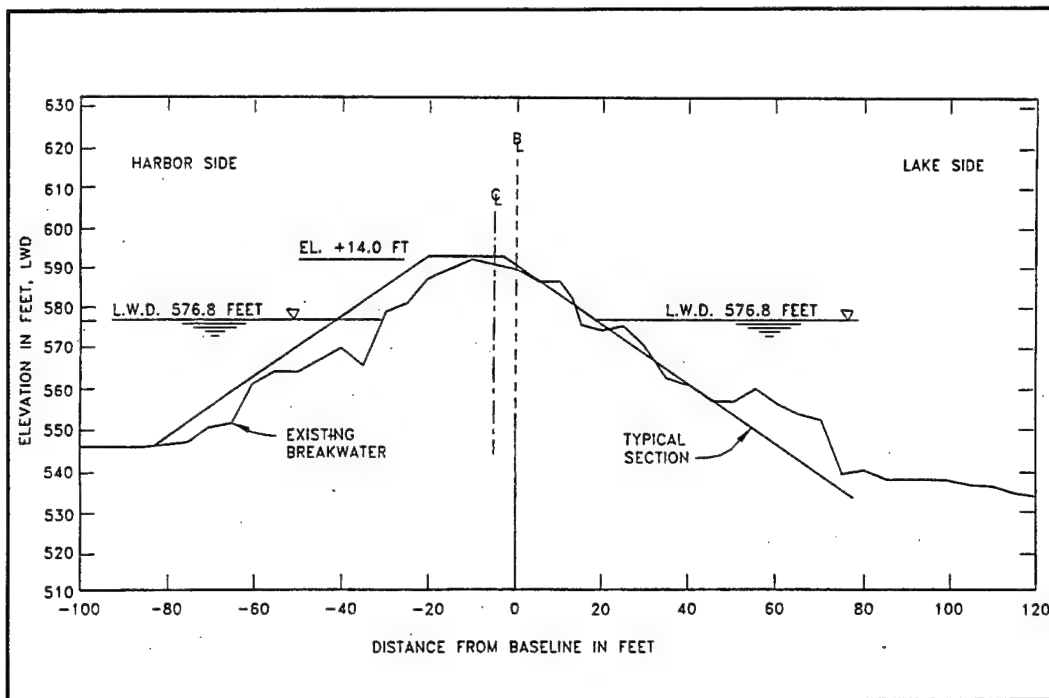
1985 Survey cross section, Station 29 + 00
